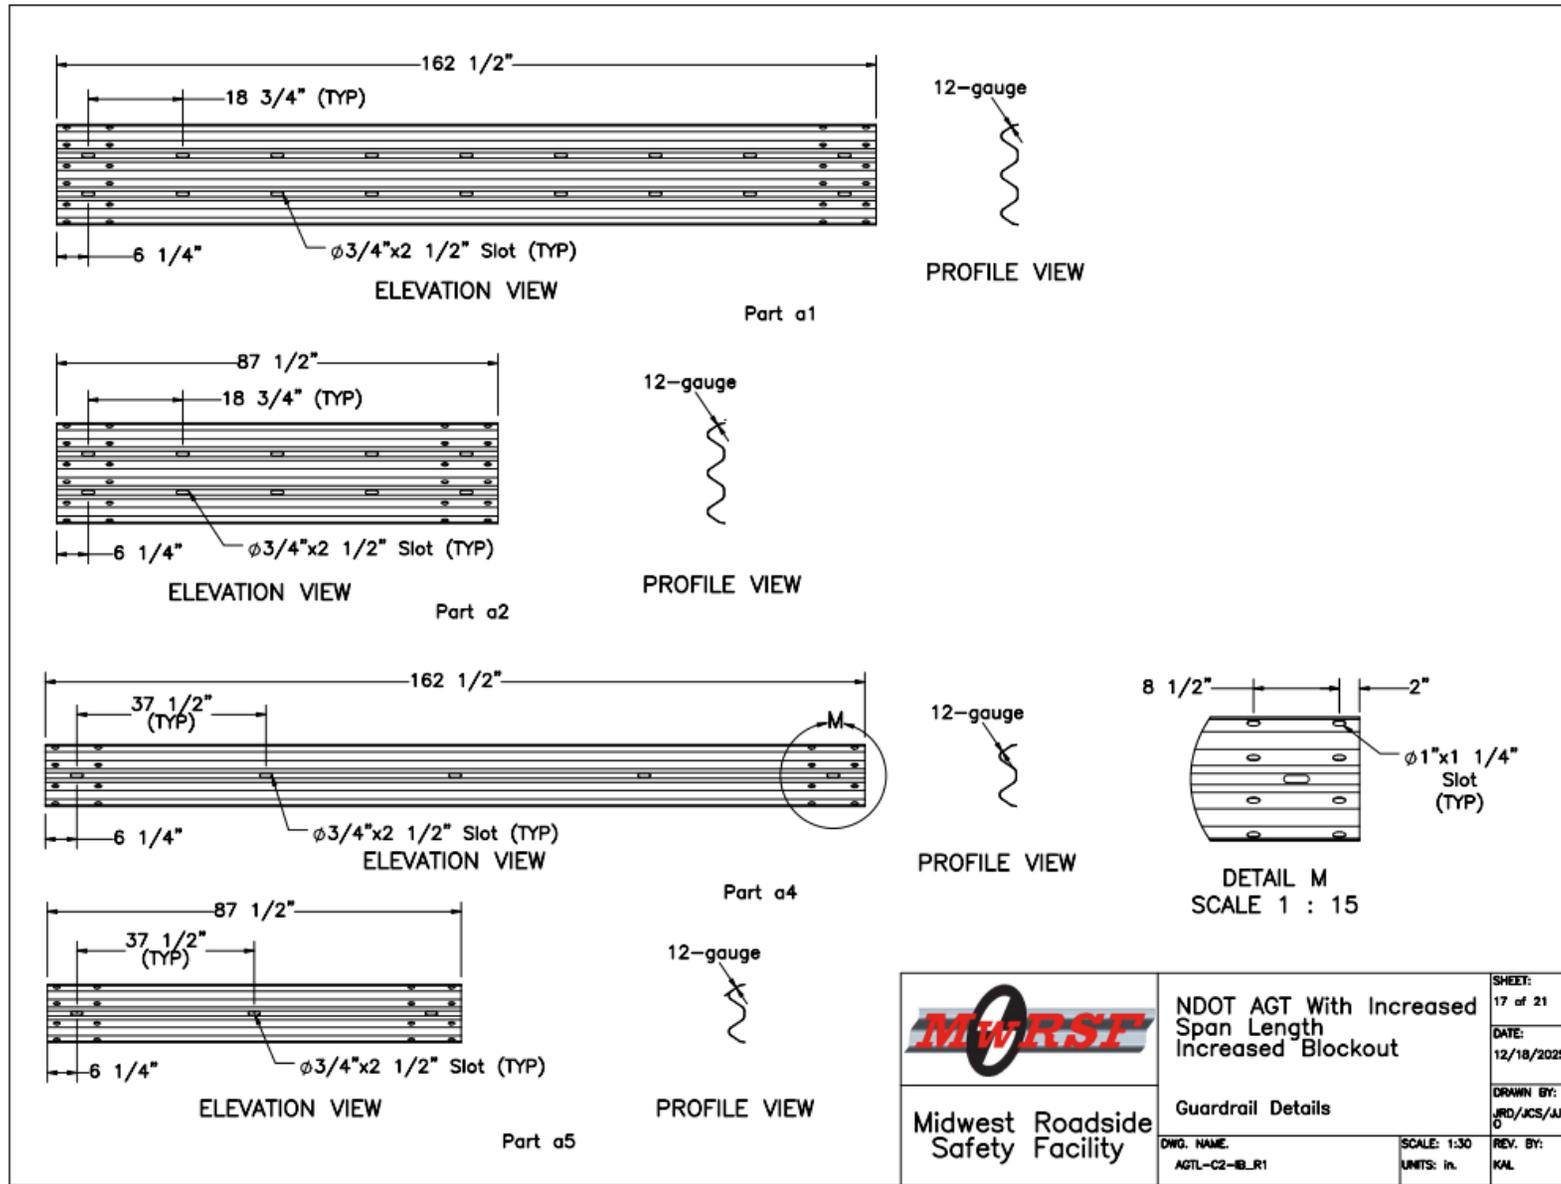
NDOT AGT With Increased Span Length, Guardrail Details, Concept 2
